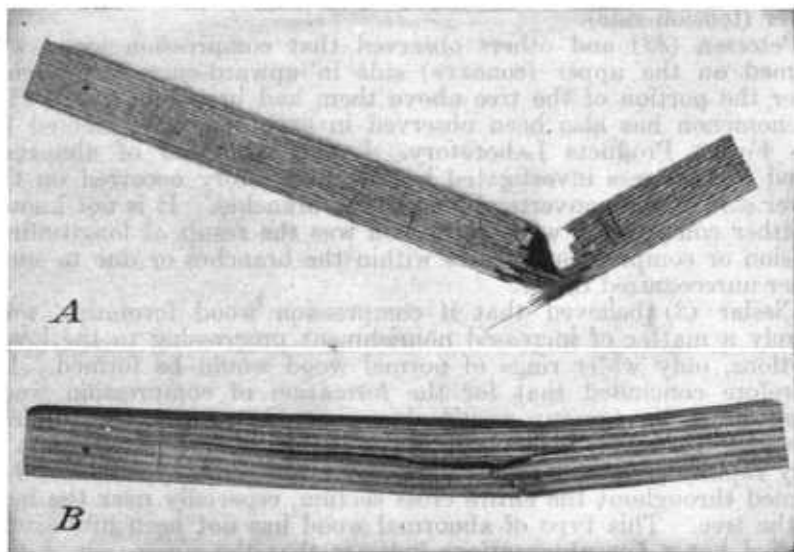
Typical static bending failures of normal wood (A) and compression wood (B).
